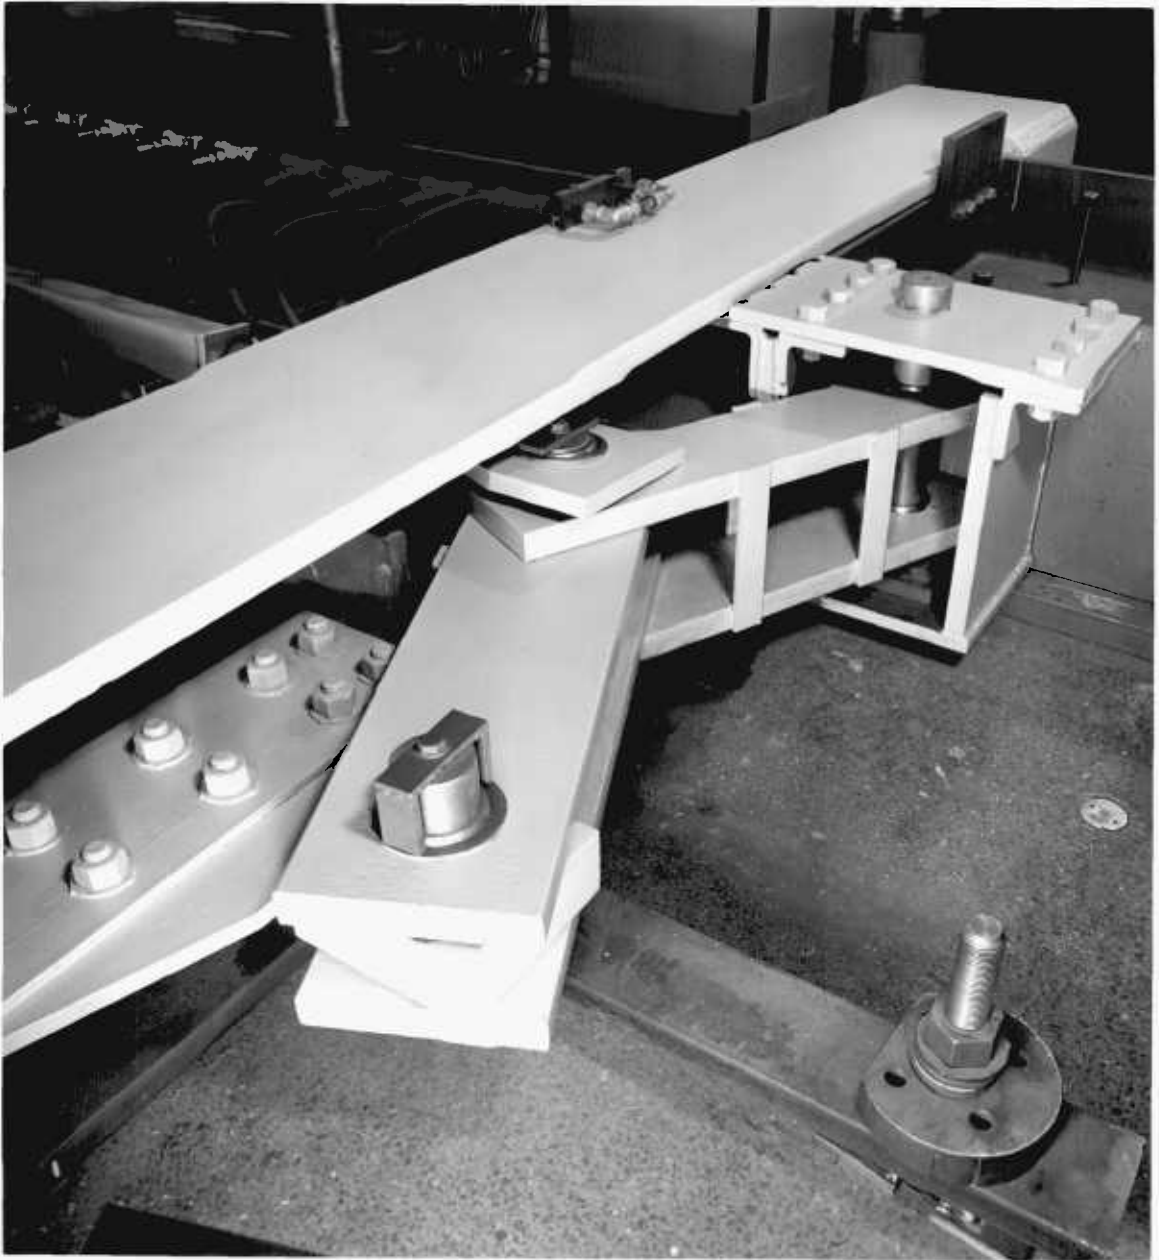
Parallel arm mechanism showing connections to beam A and the loading beam
